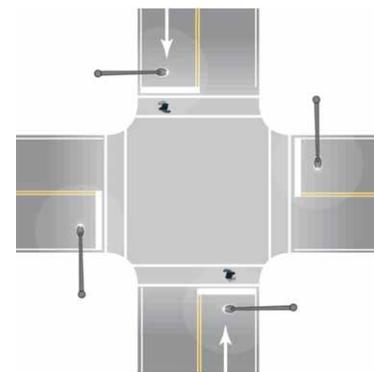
Drawing. New design for intersection lighting layout for crosswalks.
